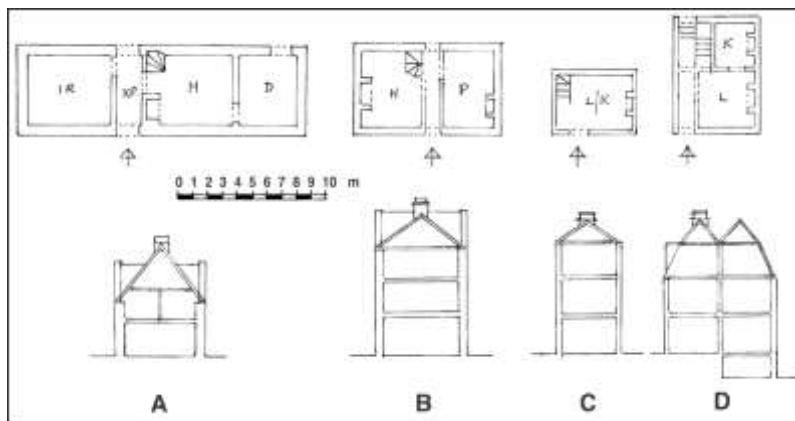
Plans and sections of some Batheaston Houses (ignoring later extensions)
